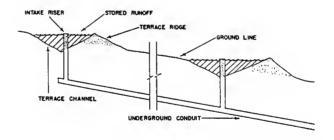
Cross Section of a Pipe Terrace Outlet System.
